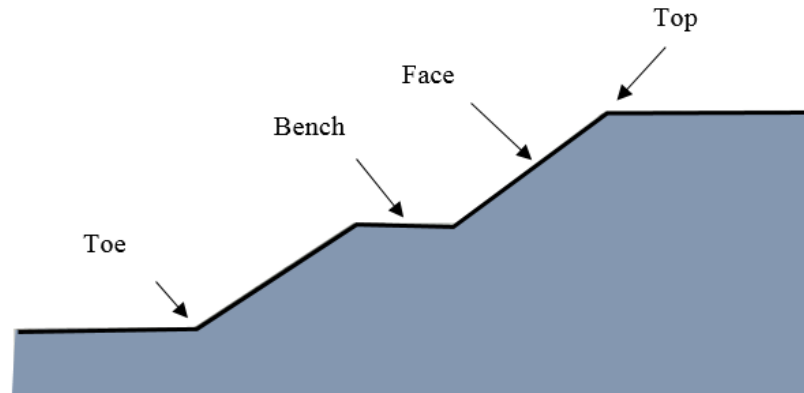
Example benched slope (adapted from Coduto, et al. 2011)
